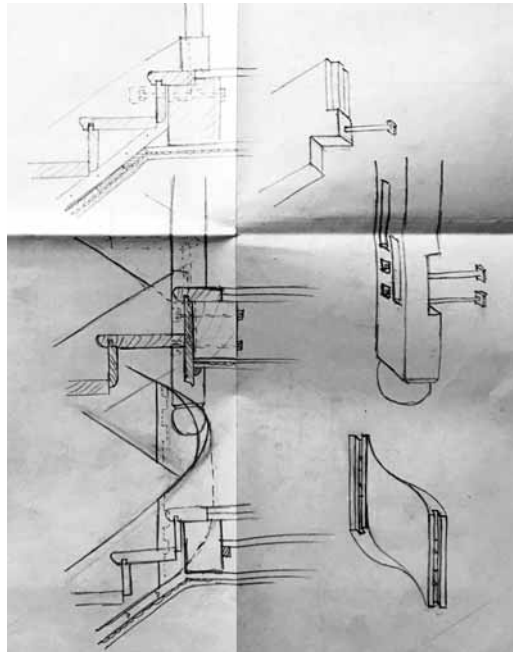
Wooden staircase, detail, sketch, course Building Constructions II
